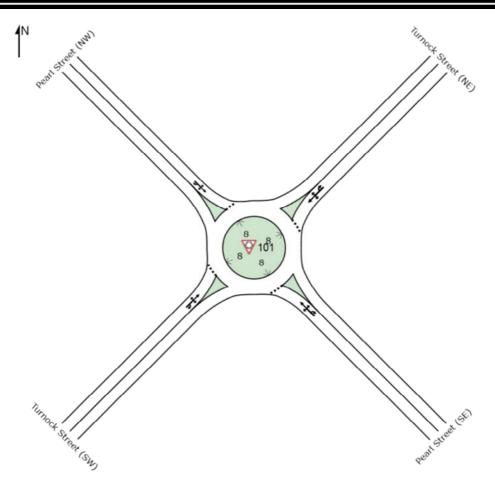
Turnock Street / Pearl SIDRA Intersection Layout
